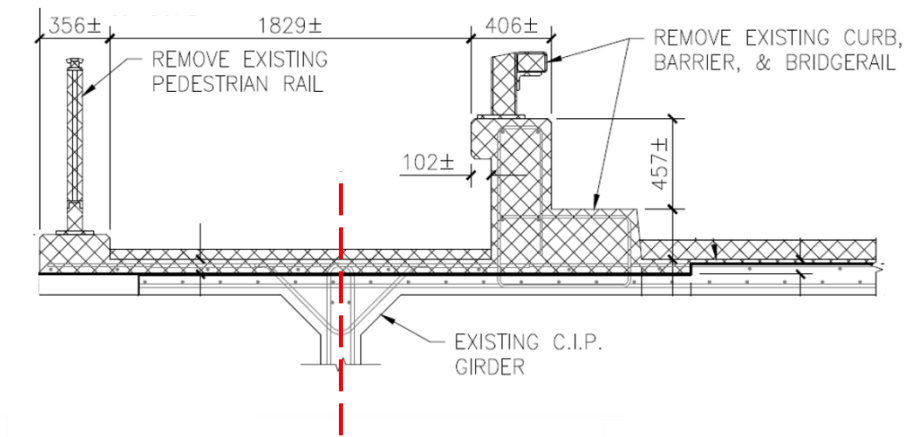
Cross Section of In-Scope Proposed Walkway (2.1 m wide)
